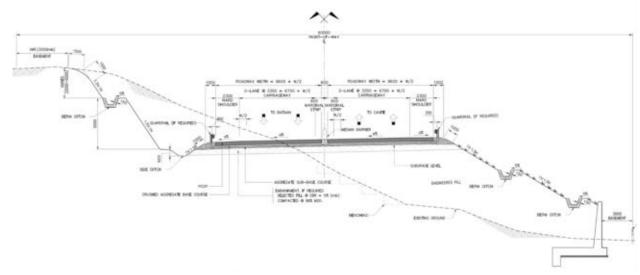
Mainline Cross Section with Super-elevated Section in Bataan
